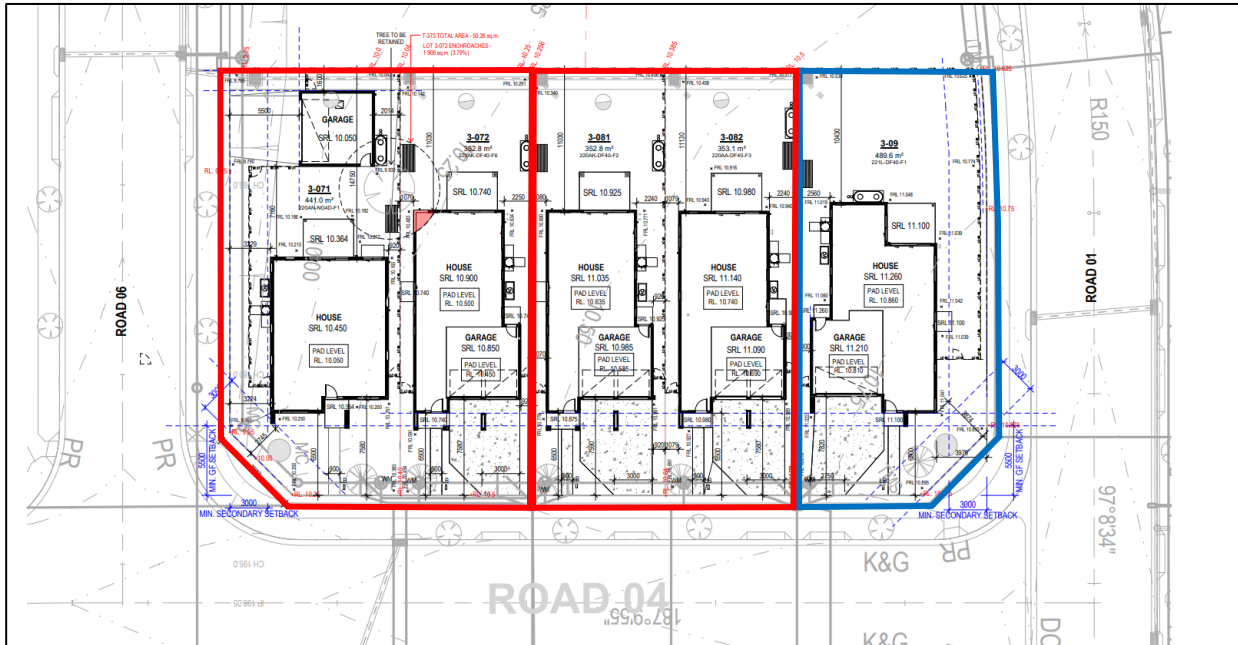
PROPOSED DEVELOPMENT (PROPOSED LOTS 3-09, 3-071, 3-072, 3-081, 3-082)
